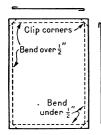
Method of folding edges of sheets for making flat seams.
